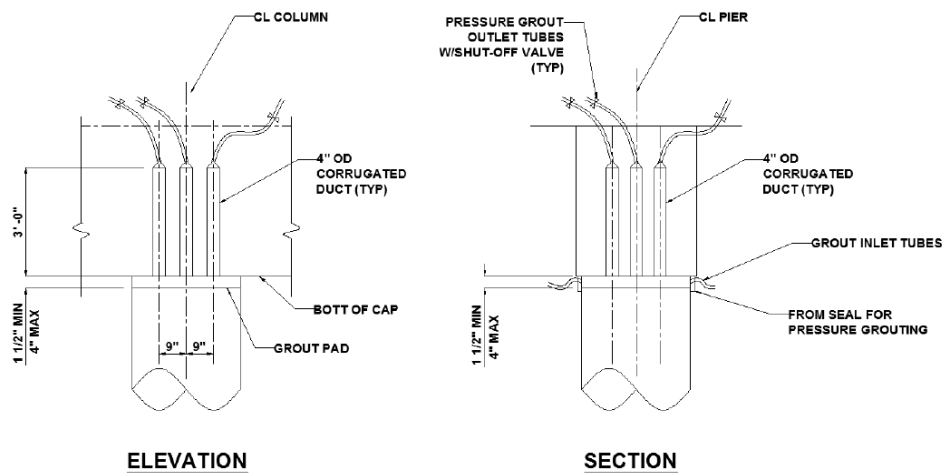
Precast column to bent cap with grouted corrugated duct connection (Atkan and Attanayake 2013)
